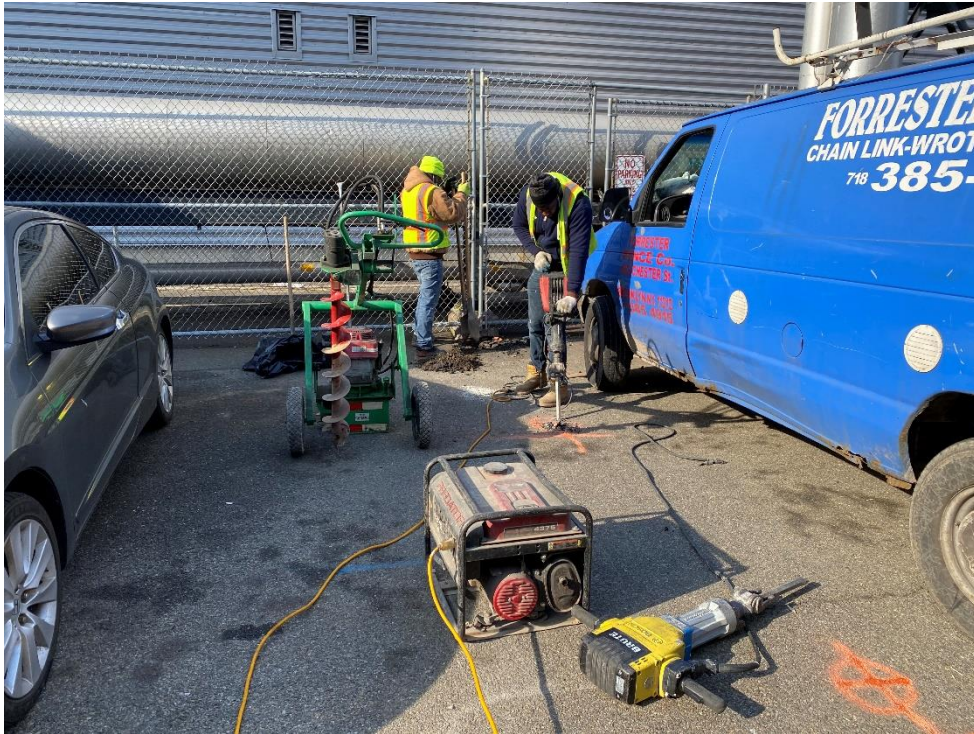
View of Forrester excavating holes for fence post installation (facing southwest)
